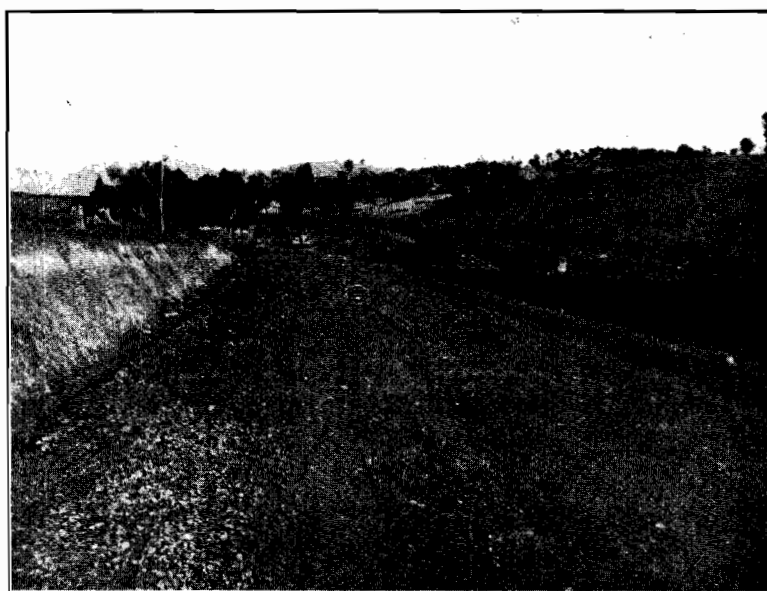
Showing a completed section of the Taggerty-Thornton Road in the Shire of Alexandra.
